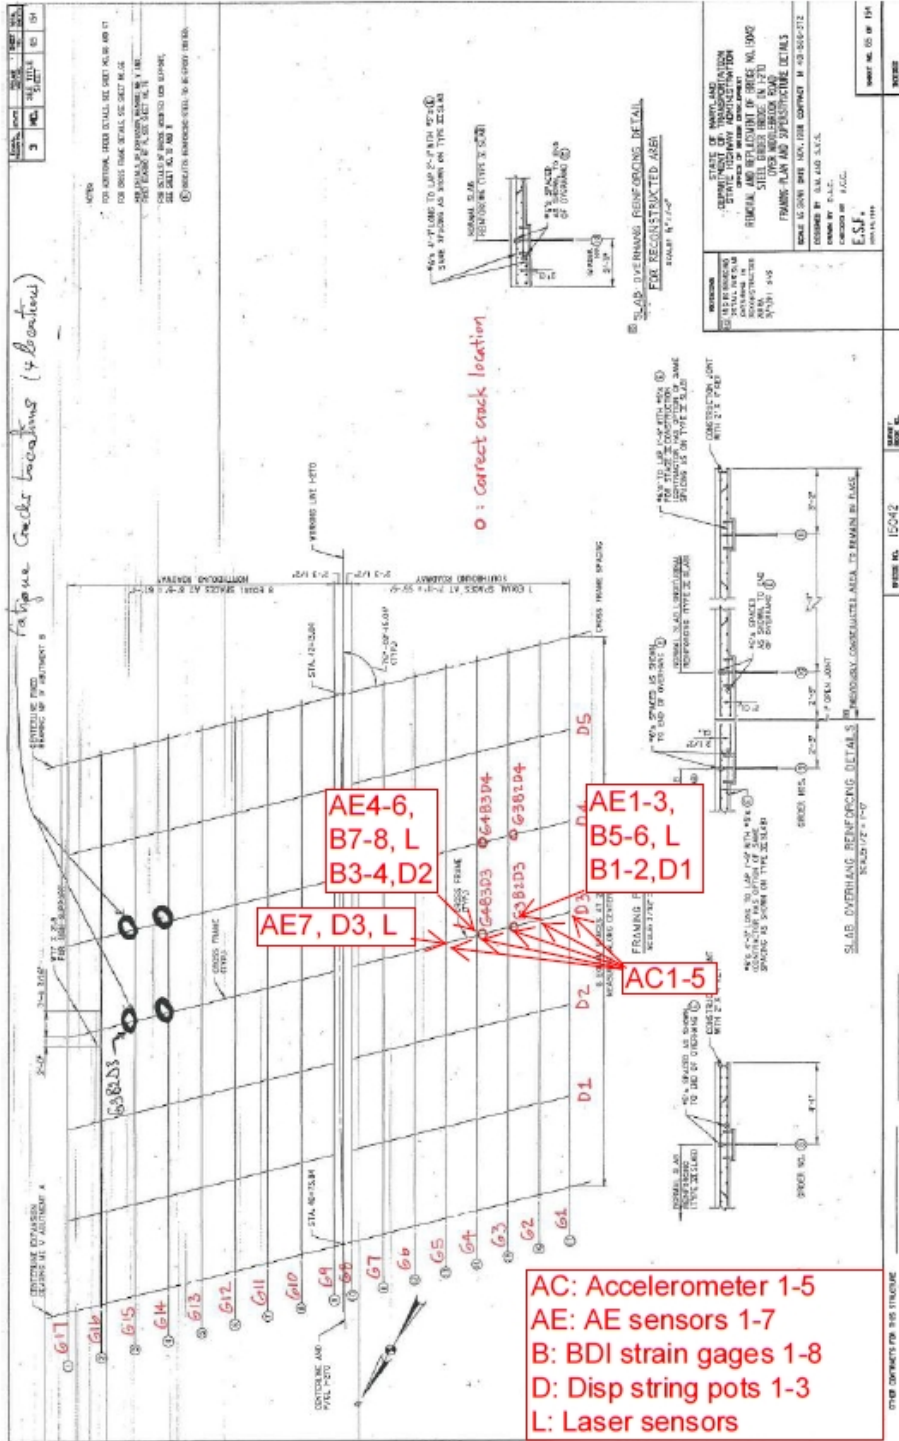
Crack locations and sensor placement on the framing plan
